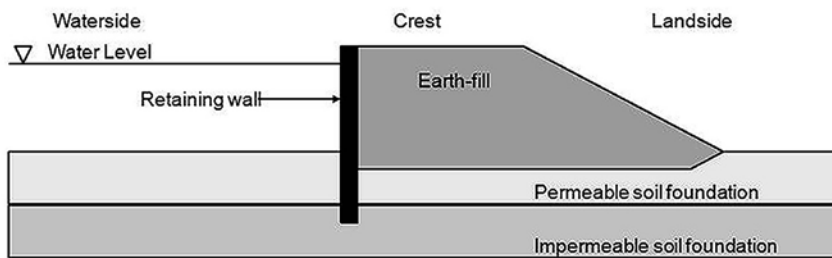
Composite levee with retaining wall on thin permeable soil foundation
